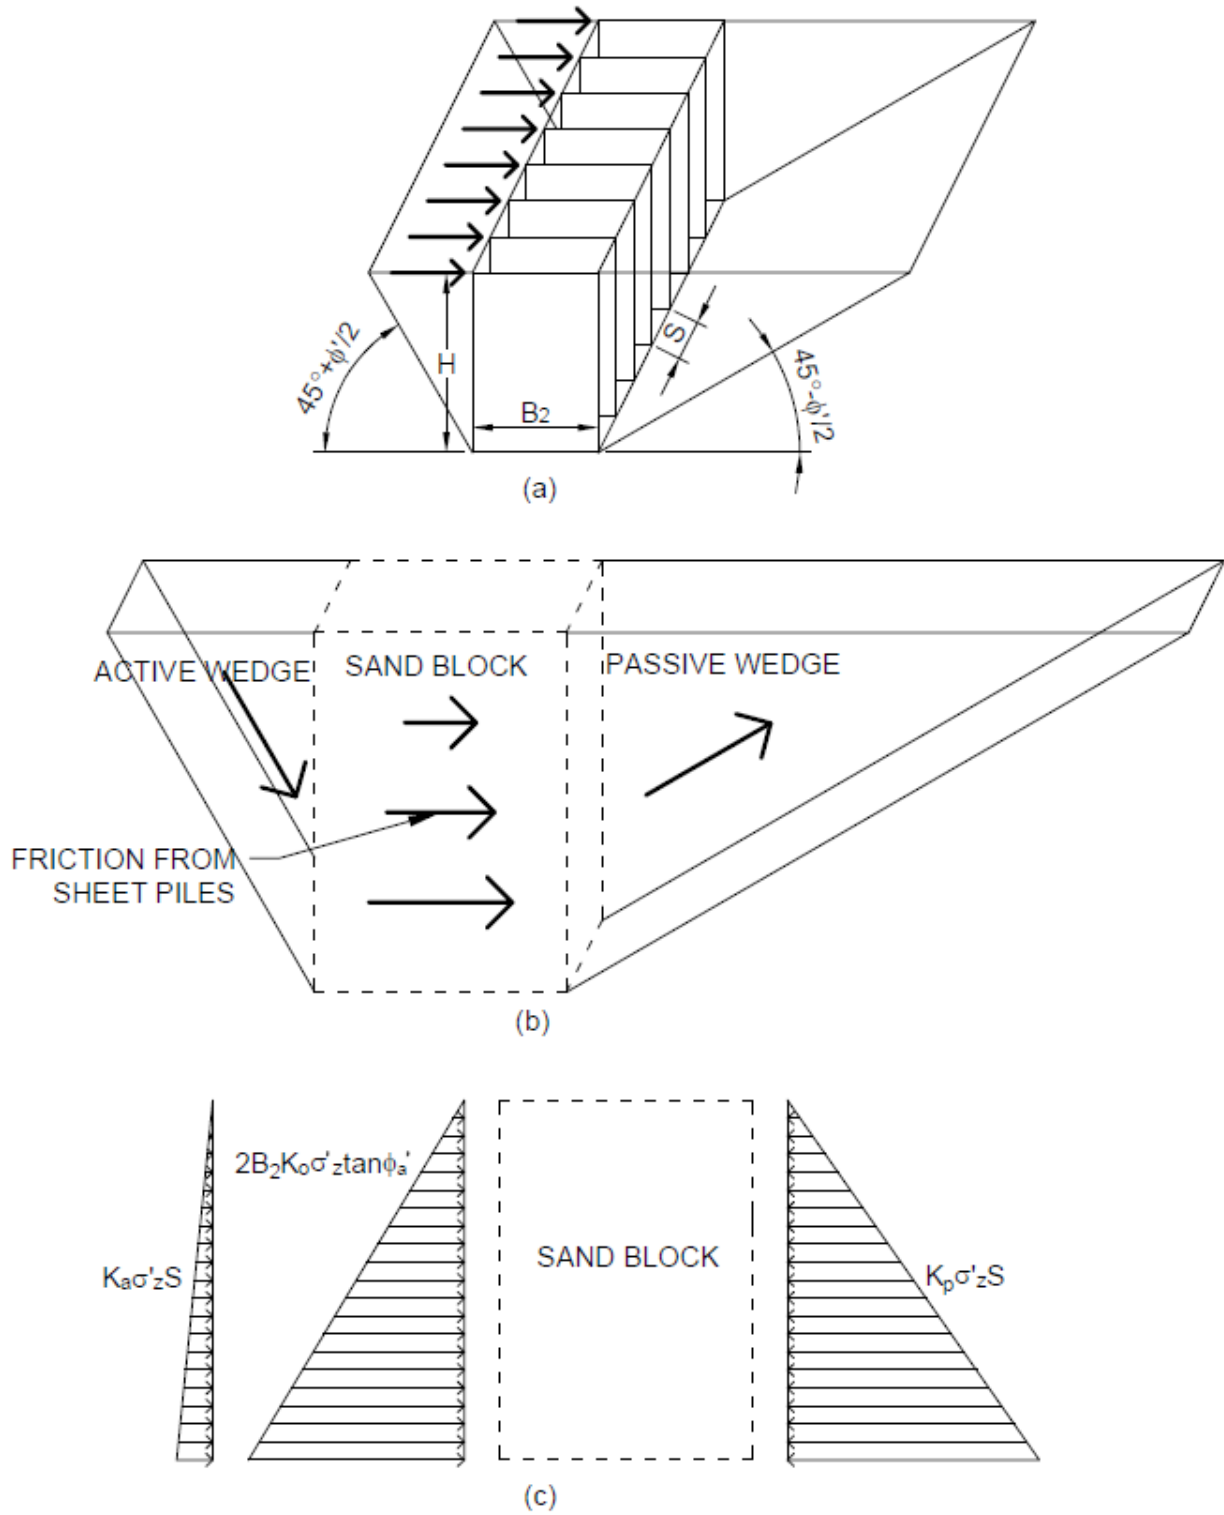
Closely spaced sheet pile walls in cohesionless soil.
